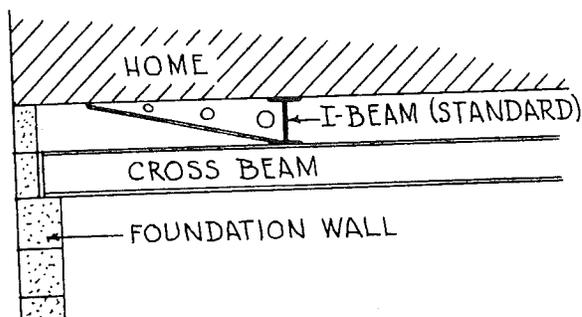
The I-beams of a standard frame rest on cross beams set into the foundation walls.
